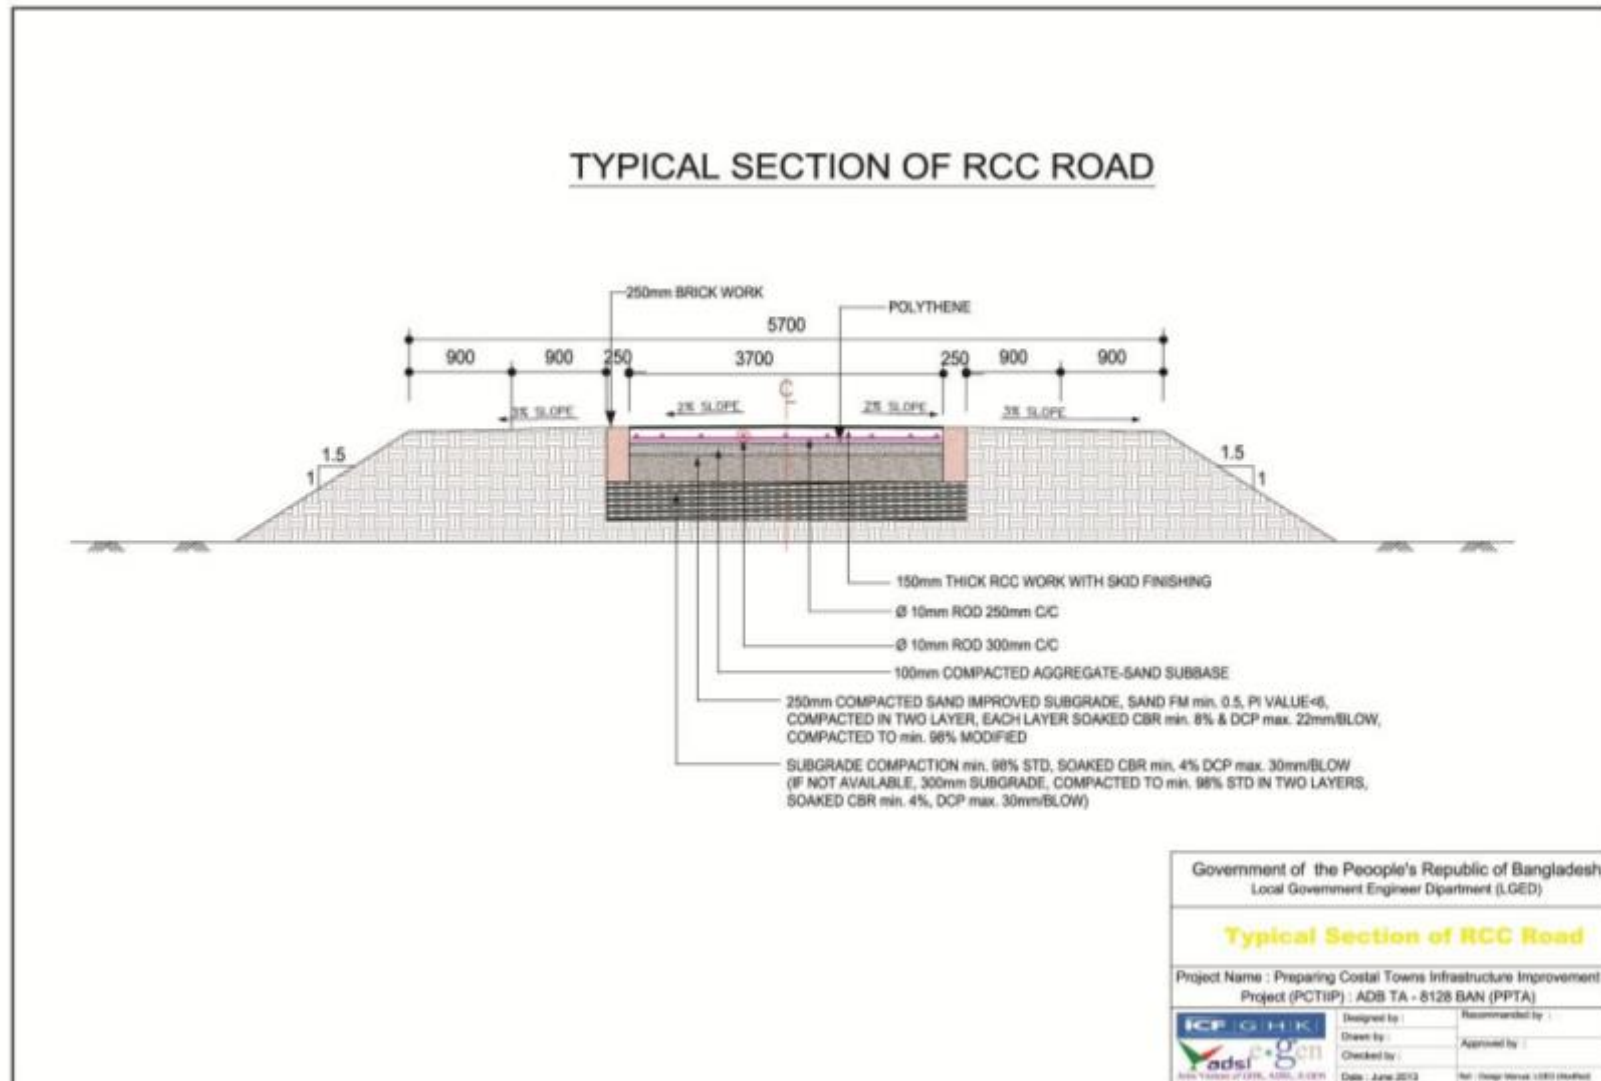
Typical Section of Reinforced Concrete Cement (RCC) Road
